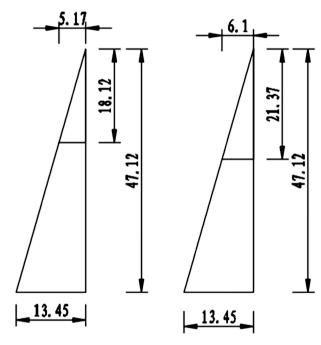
Dimensions of auxiliary hoist for reinforcement cage lifting (m) 图 7. 副吊钢筋笼吊装尺寸(m)
